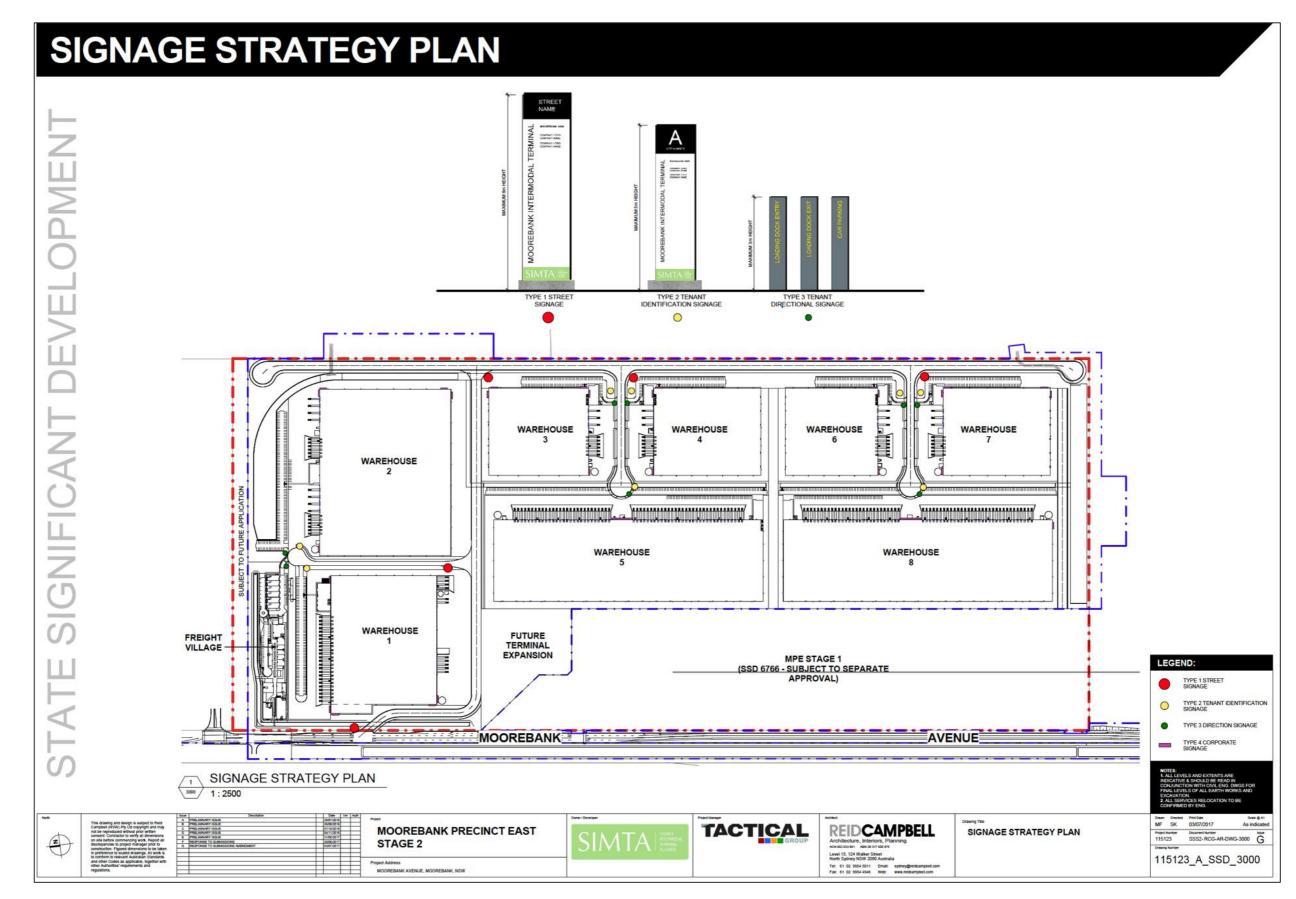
| Examples of wayfinding signage (Source: Applicant's MOD 1 Modification Report)
